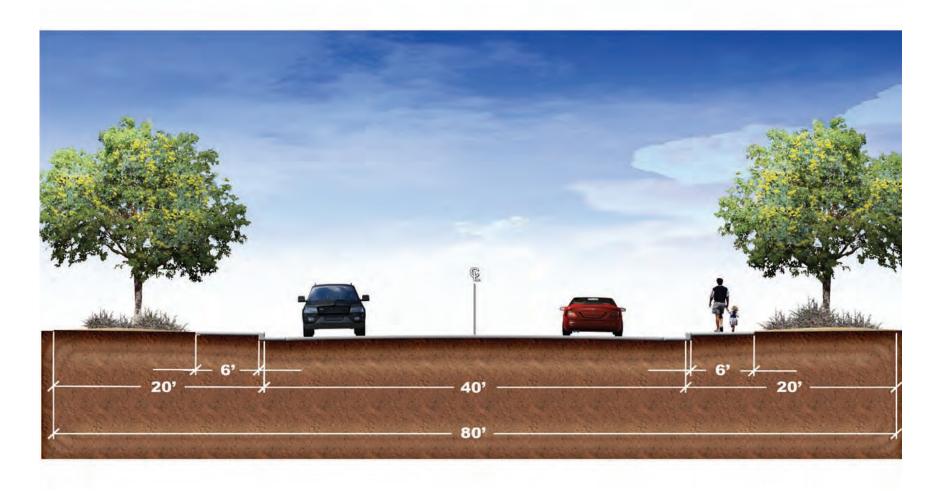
| Themed Road(s) - C Section (80' R.O.W.) 2nd Street
